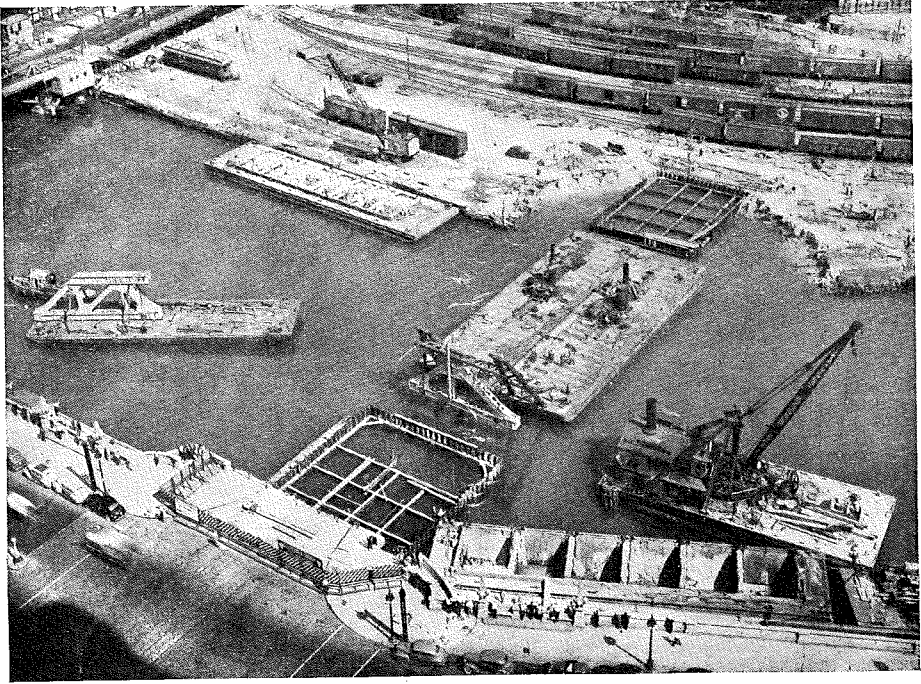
COFFERDAM ILLUSTRATED IN FIG. 75 UNDER CONSTRUCTION.
